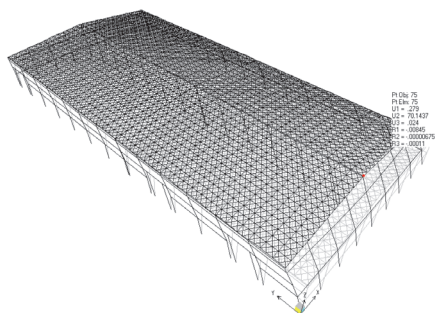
Deflection in Y direction from seismic load, on a model with roof and without wall panels
